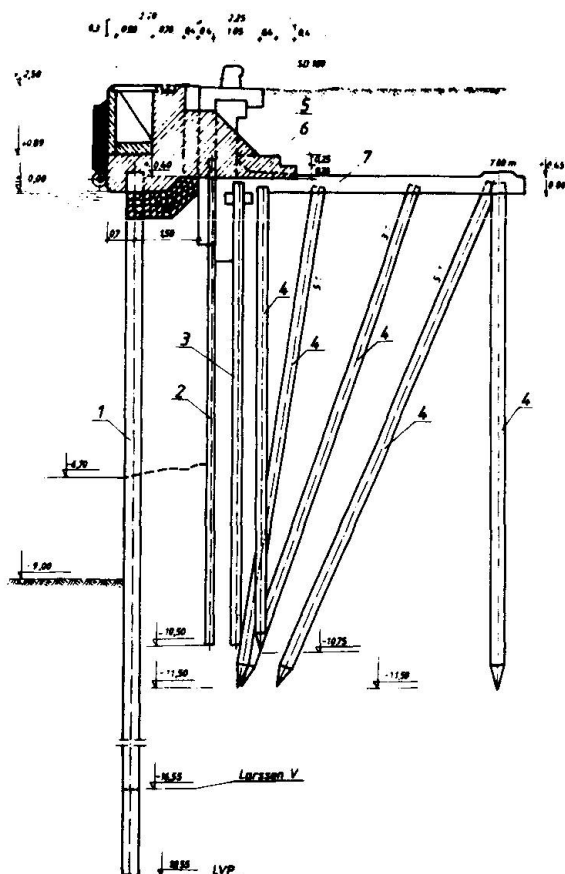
Strengthening of the Swedish Quay in Gdynia [3]: 1-steel sheet wall Larssen V strengthende with box type piles LVP, 2-existing timber sheet wall, 3-steel sheet wall, 4-timber piles, 5-longitudinal anchoring beam, 6-transverse anchoring beams, 7-existing cover plate
